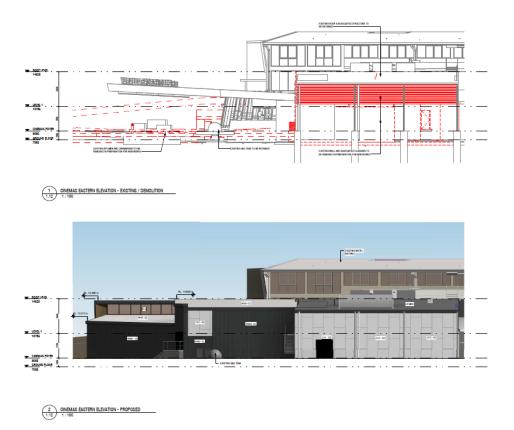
Proposed Eastern Elevations (including existing/demolition)
